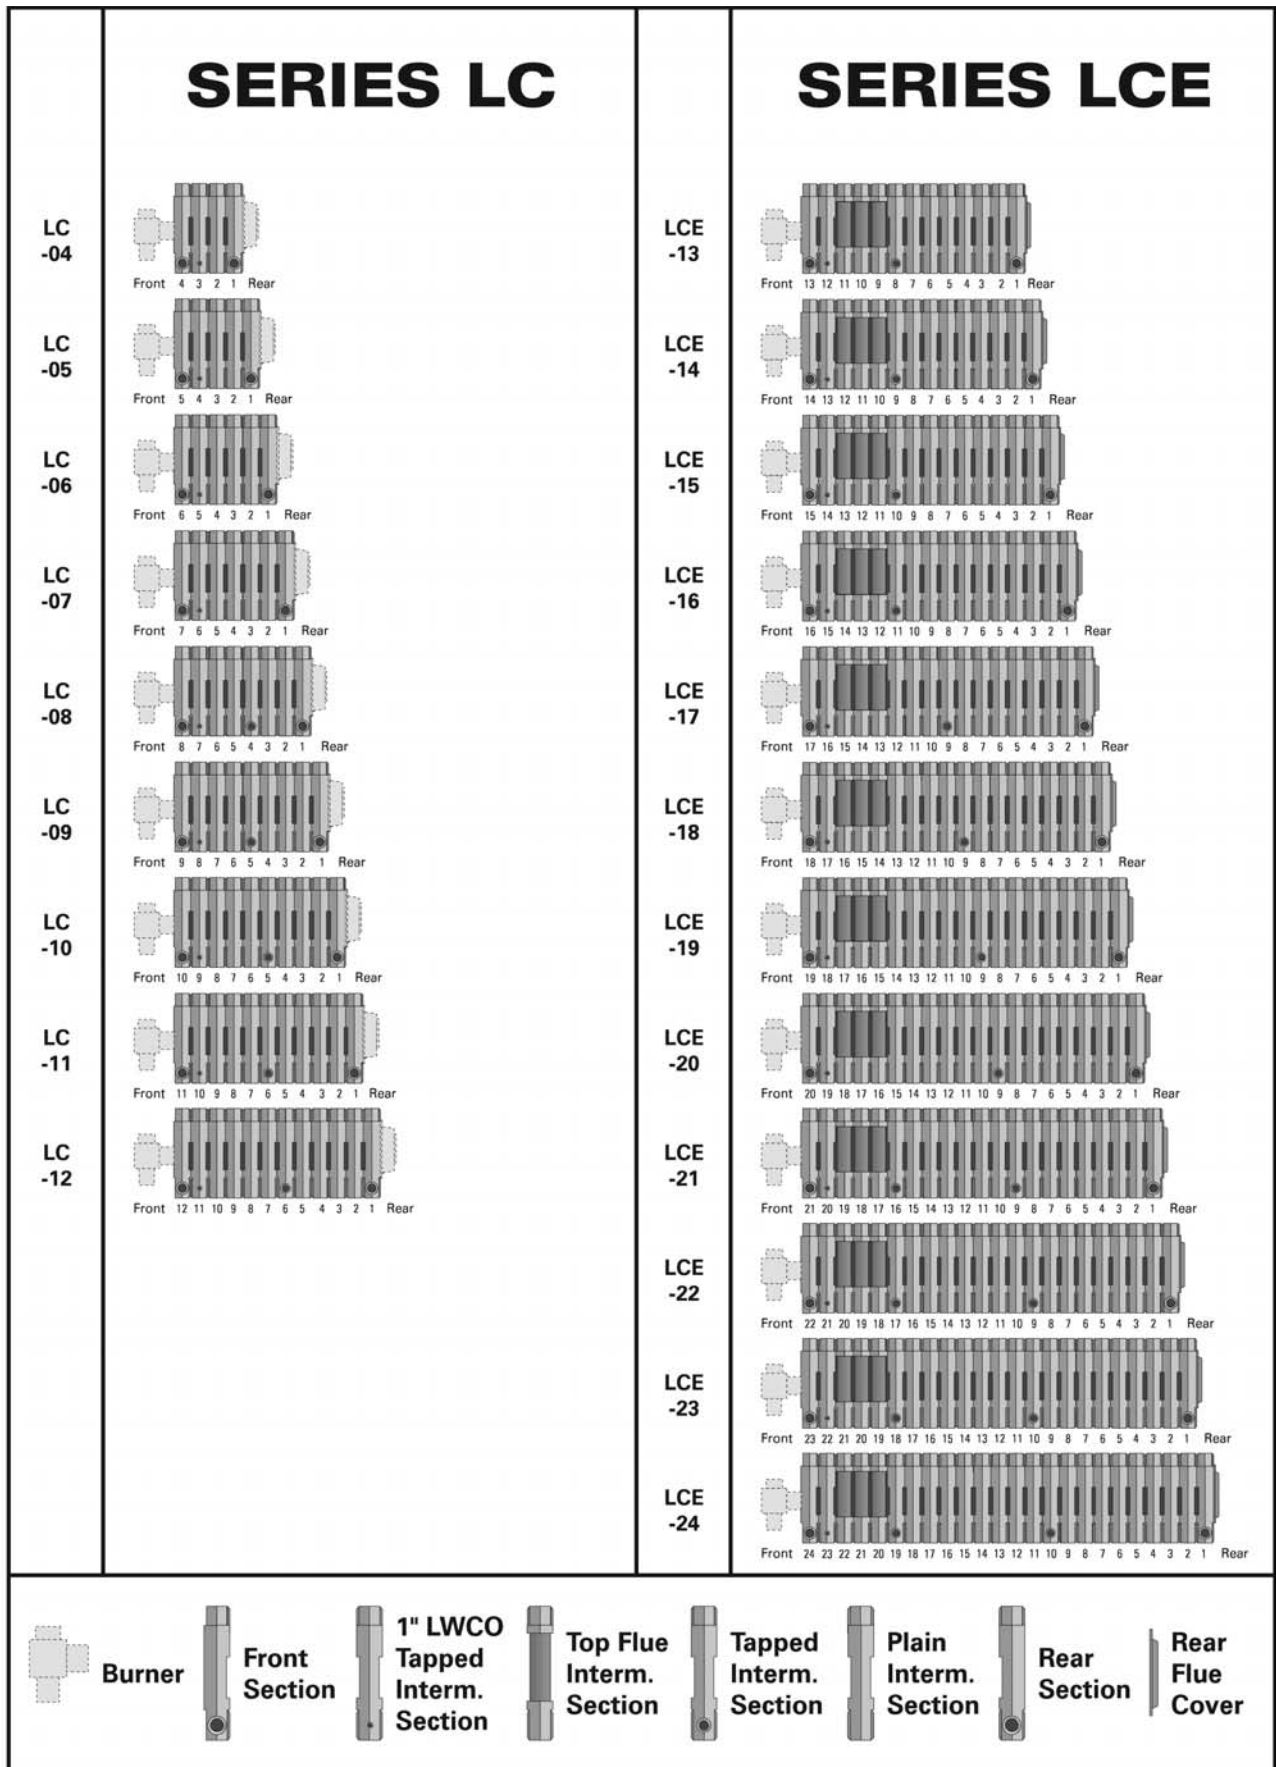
LC/LCE Boiler Section Assembly Sequence
